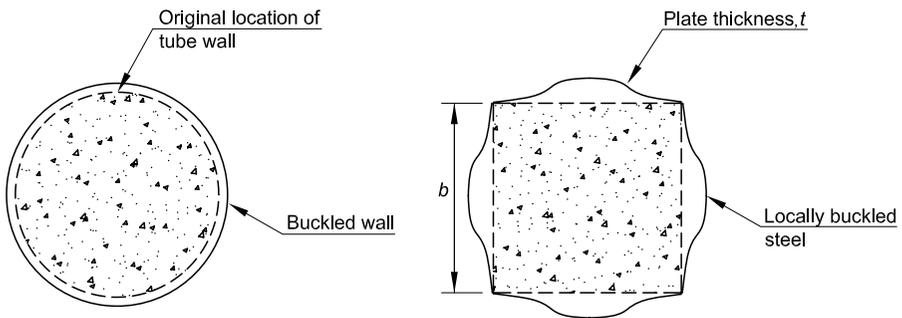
Change in cross-sectional buckling mode due to concrete infill.
